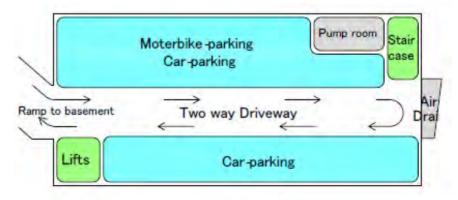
Zoning of the New OPD Building: Basement Floor
